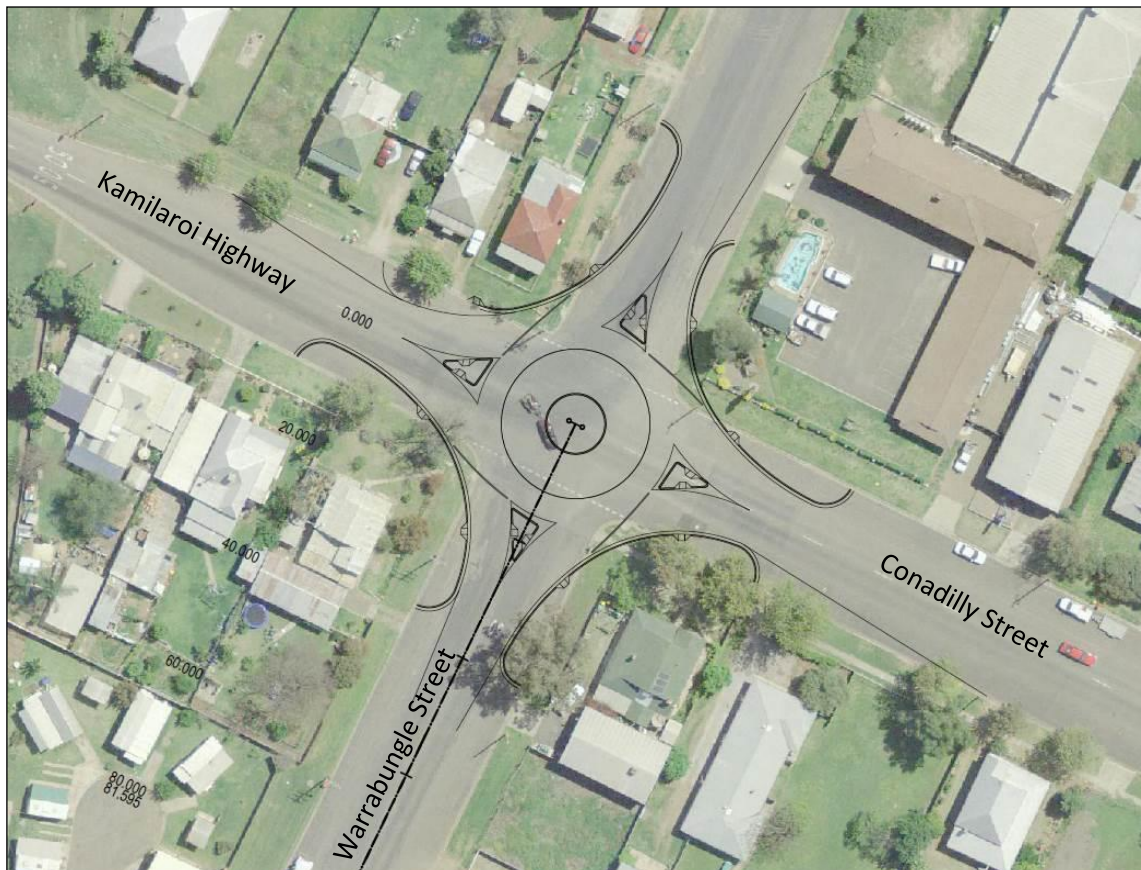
Roundabout-controlled Kamilaroi Highway and Warrabungle Street intersection
